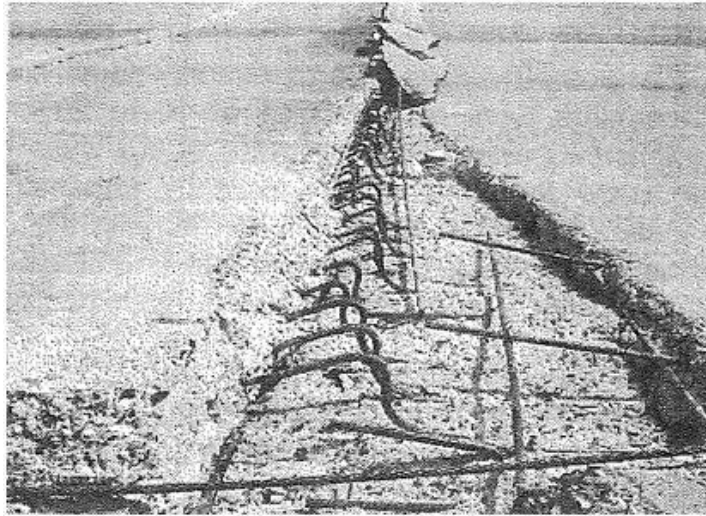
Concrete facing failed in compression along a vertical joint (from Pinto [16]).
